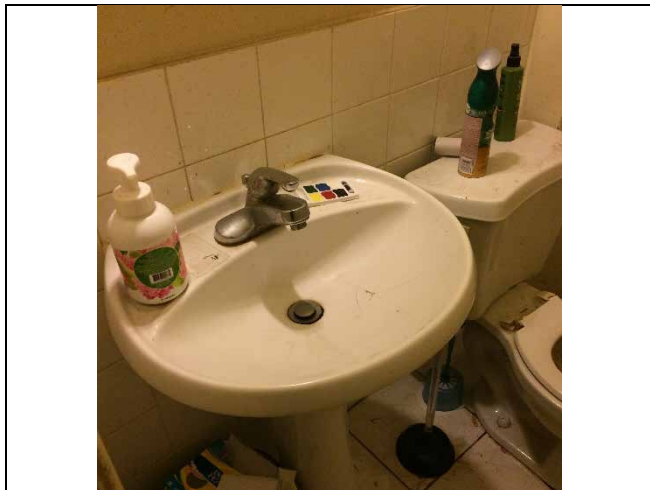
Asbestos-containing drywall joint-fill compound on the walls and presumed asbestos-containing ceramic tile grout and mortar/adhesive on the walls and floor in the washroom, observed to be in good condition at 284 Bartholomew Street Unit #4.
